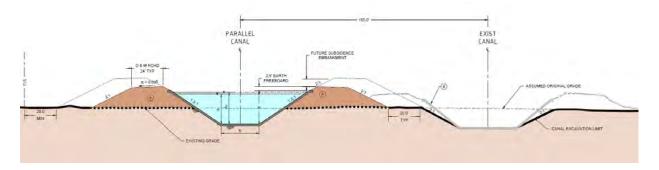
Trapezoidal Cross Section of Realigned Canal Segments in the Recommended Plan
